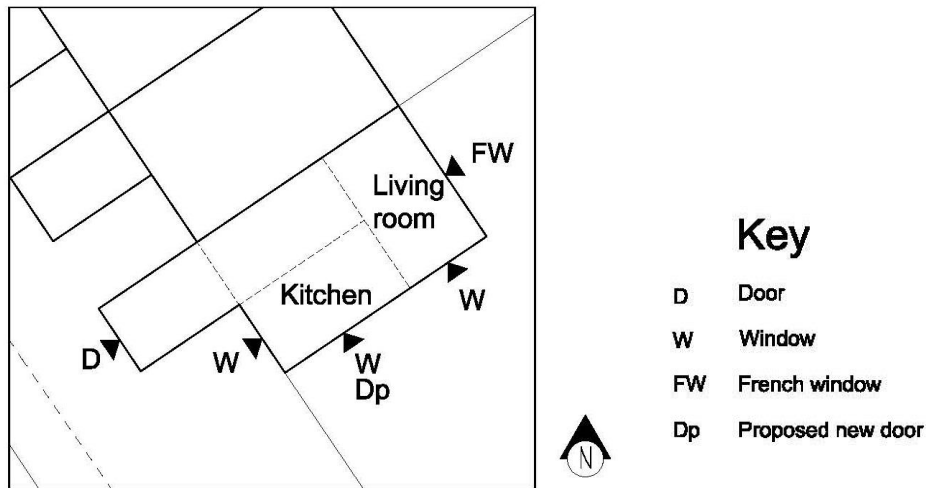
Schematic plan view of house A3 (Karen) showing orientation of existing doors and windows and proposed location of new door (not to scale)
